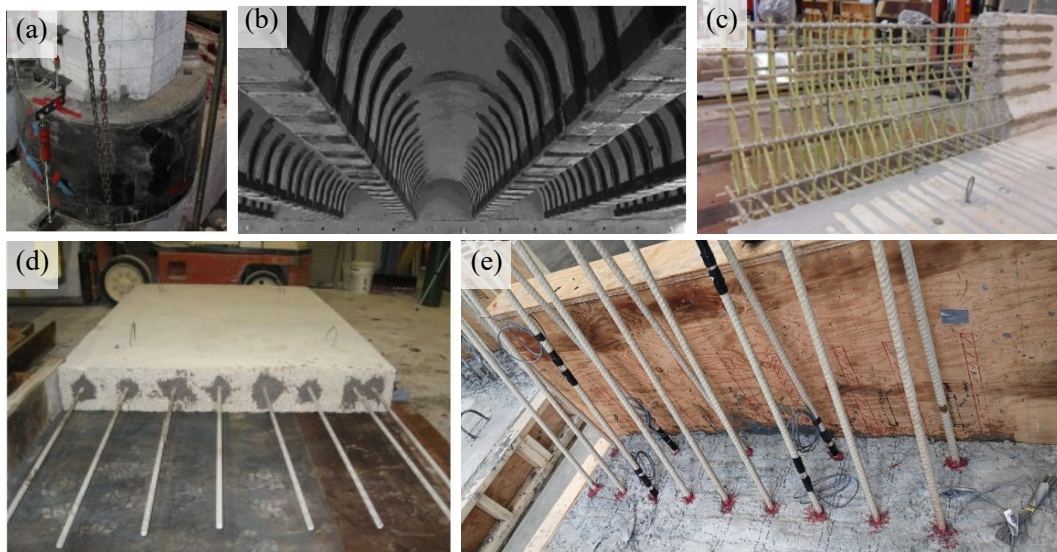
Applications of FRP in structural retrofitting (a) sheets used to enhance confinement in columns (Wu and Pantelides 2017), (b) Shear and flexural strengthening of bridge girders using sheets (ACI 440R 2007), (c) NSMBs used for bridge barrier repair (El-Salakawy and Islam 2009), (d) DBs used for deck slab repair using grout (El-Salakawy et al. 2009), and (e) DBs with epoxy for repair of bridge barriers in current study.
